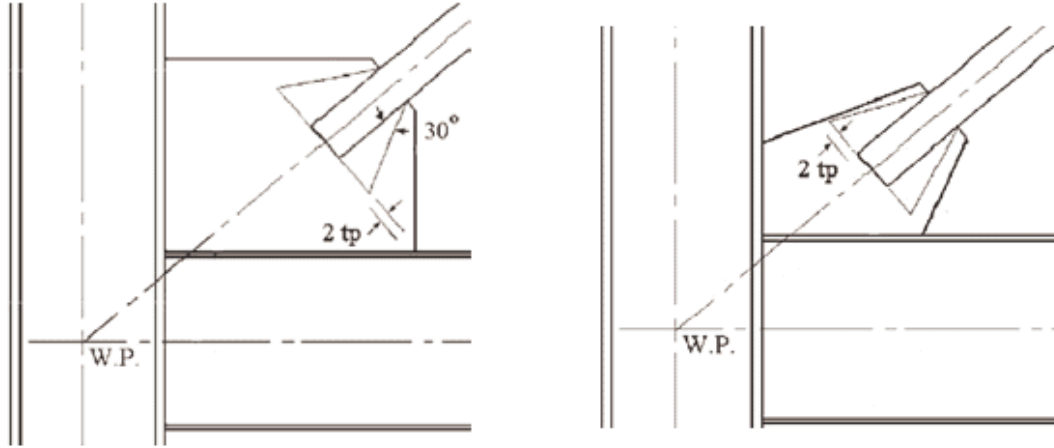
Typical Gusset Plate Connections with Current AISC Design Requirements
